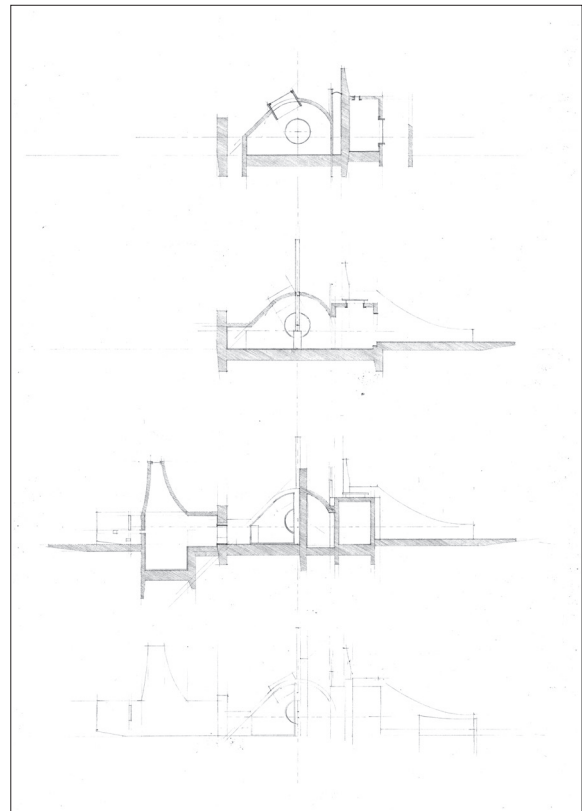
Forms and shapes of roof elements are transposed via compass tip from section to roof plan. Heights of lines and elements in section are also used to construct the projected shadow lines.
